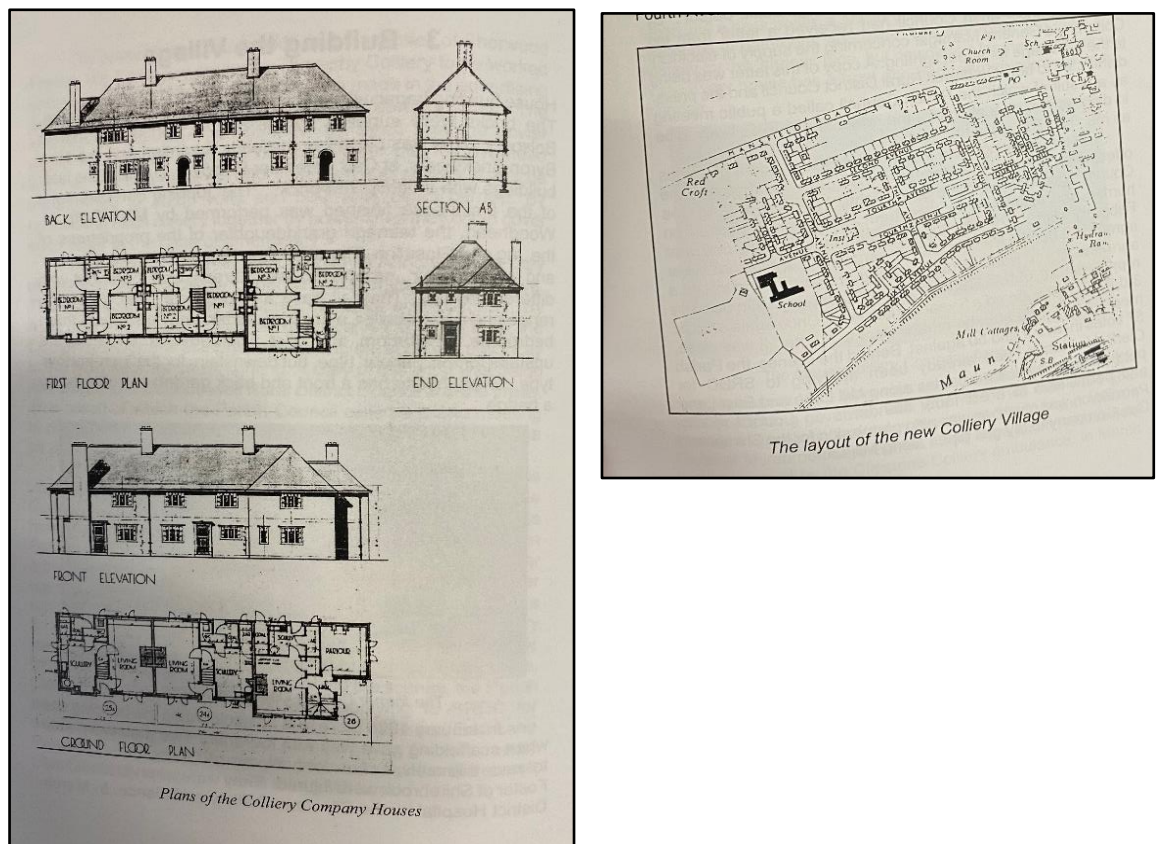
Cottage drawings and new pit village plan for Edwinstowe<sup>157</sup>
